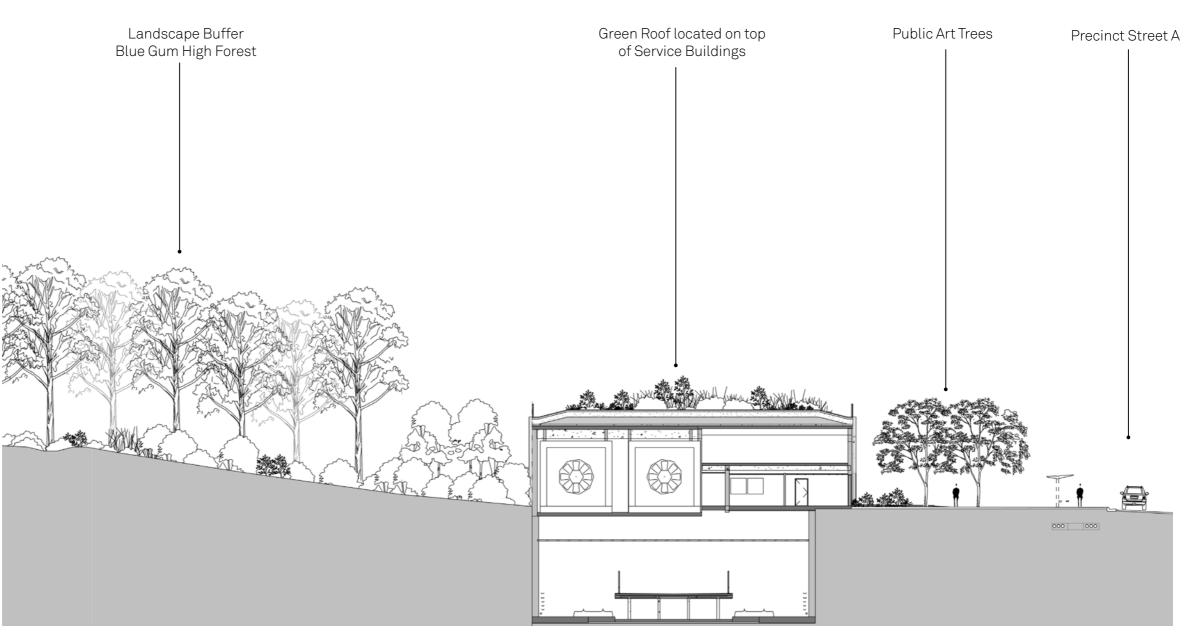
CHE\_Section showing Green Roof structure located on top of the Service Building. Source: HASSELL.
